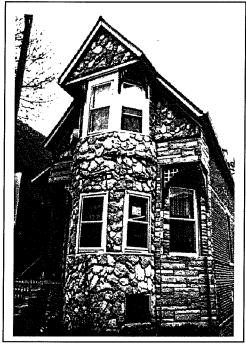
Exterior Walls – Horizontal Seam Treatment
